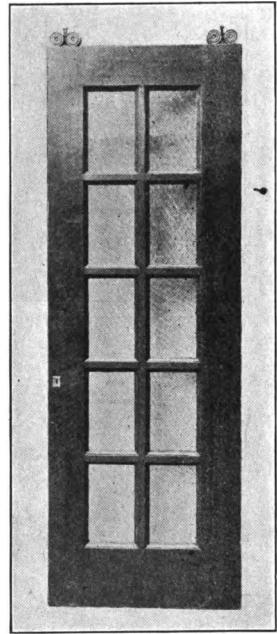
SINGLE ELEVATOR DOOR; RESIDENTIAL SECTION, NEW YORK CITY.
